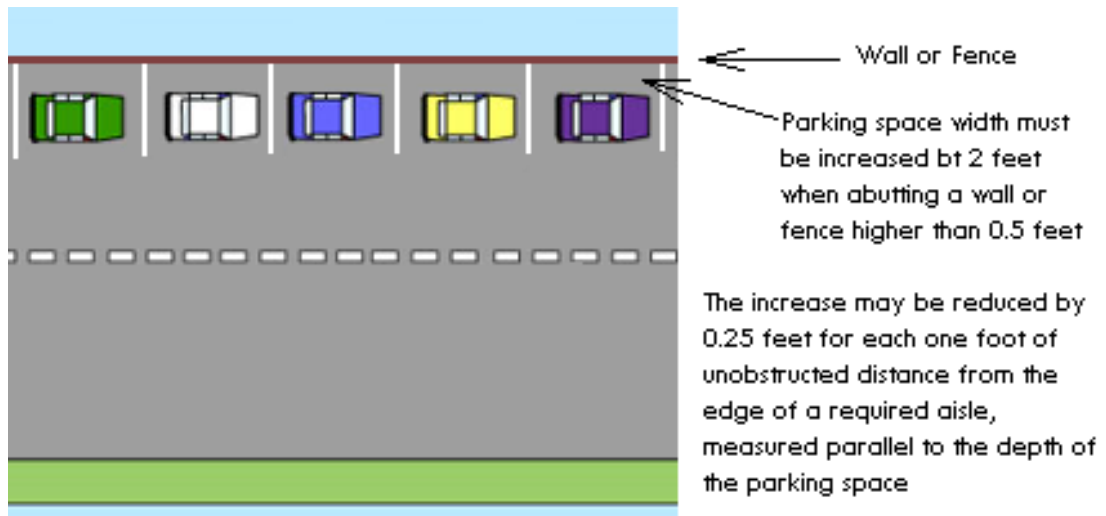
Parallel Parking Spaces Abutting Wall or Fence
